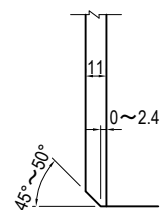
DETAIL OF IN-SITU LONGITUDINAL WELDING PART S=1:40
